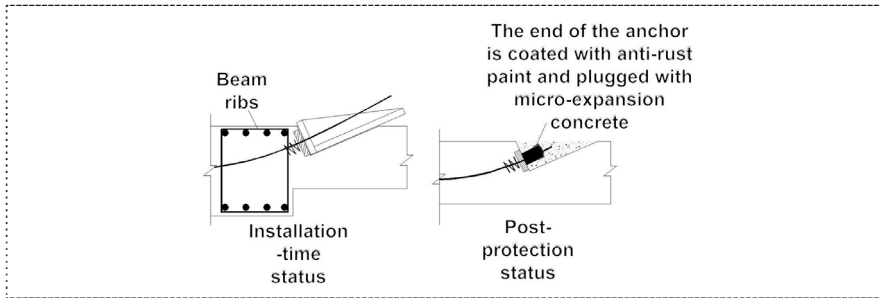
Prestressed Reinforcement Plate Surface Tensioning Sample
